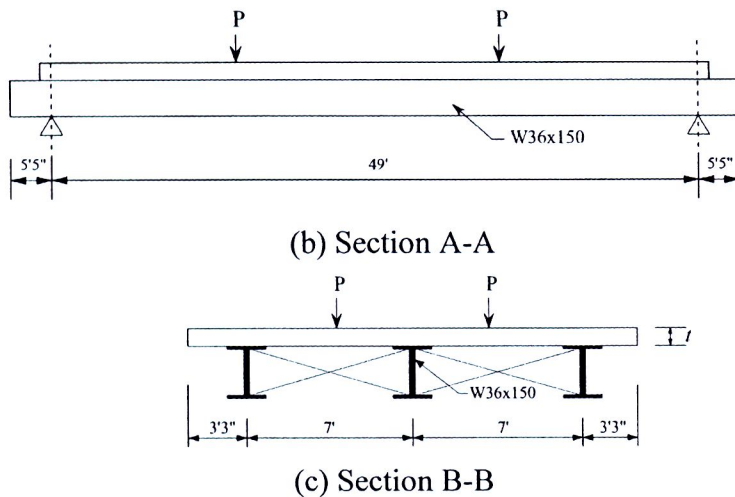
(Con't) Full-scale bridge deck configuration (Fang et al., 1990):
